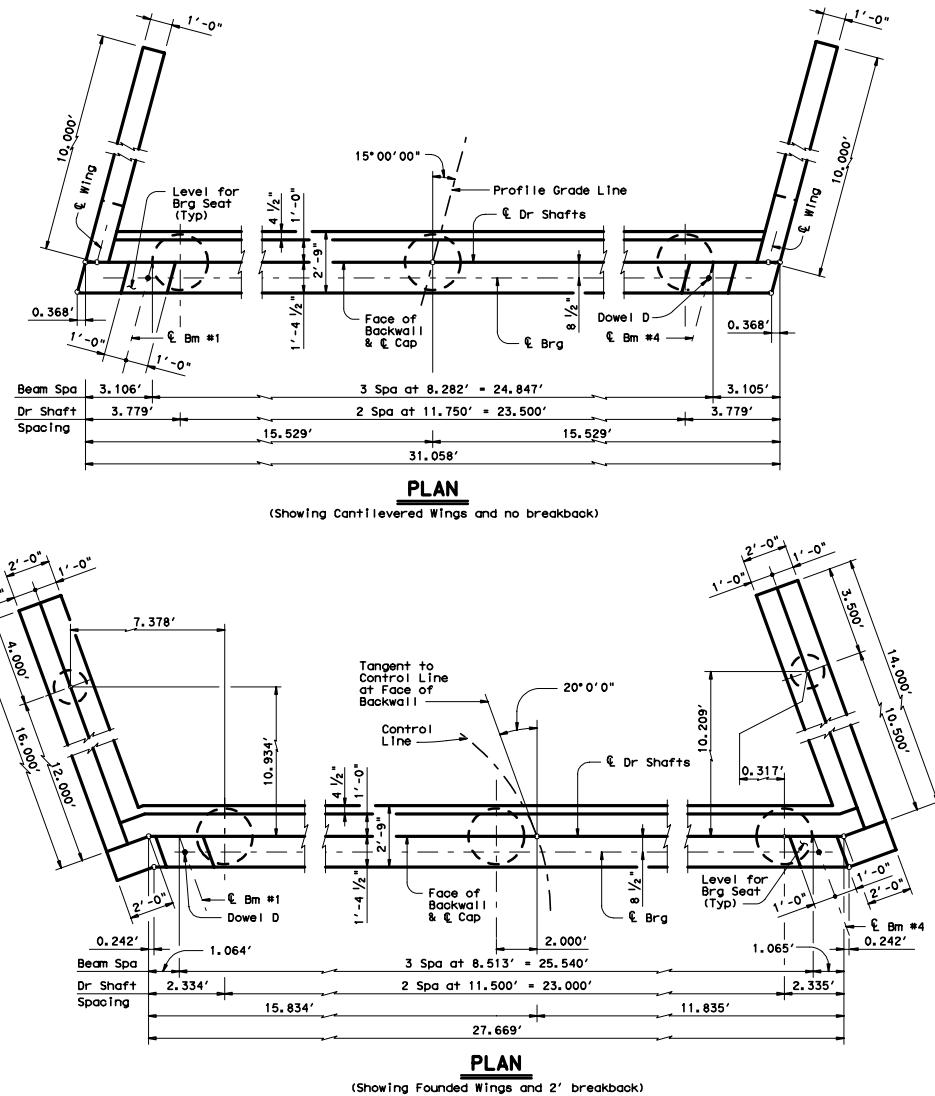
Plan View Examples. Online users can click 3-8 to view this illustration in PDF.
